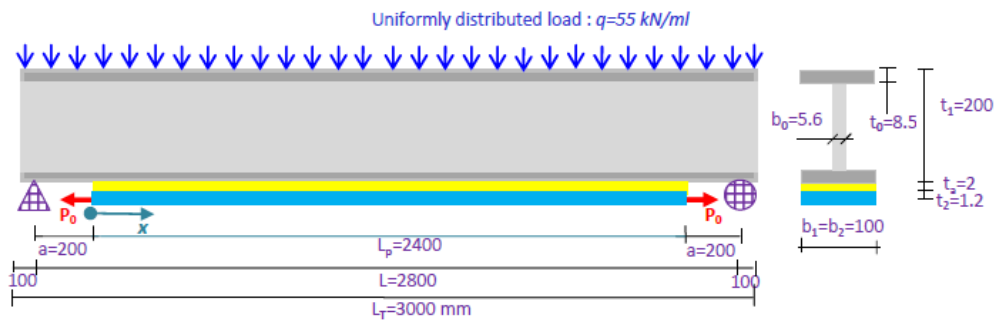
Geometric characteristic of a steel beam bonded by a prestressed composite plate
